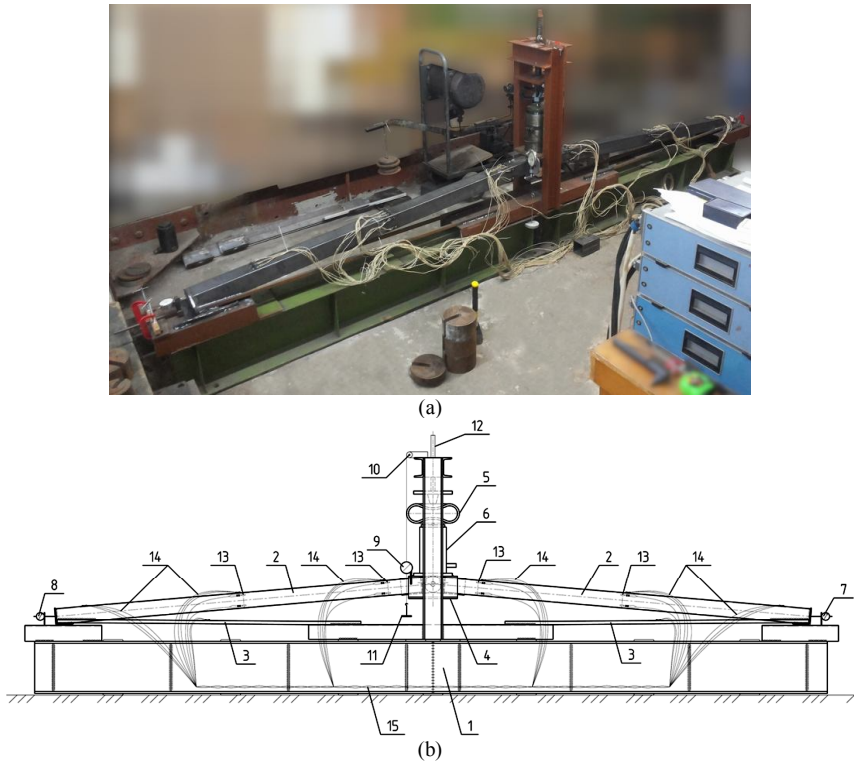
The test bench: (a) -the test model photography; (b) - the test model elements scheme.
